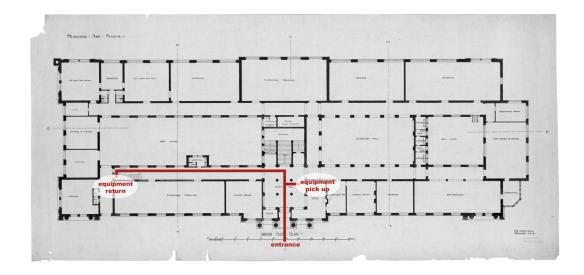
Drawing of ground floor plan, Edinburgh College of Art, Lauriston Place building. Red lines highlight pick up and return equipment points and route of WI video walk. Reproduced by permission of ©RCAHMS (Peddie and MacKay, 1907).
